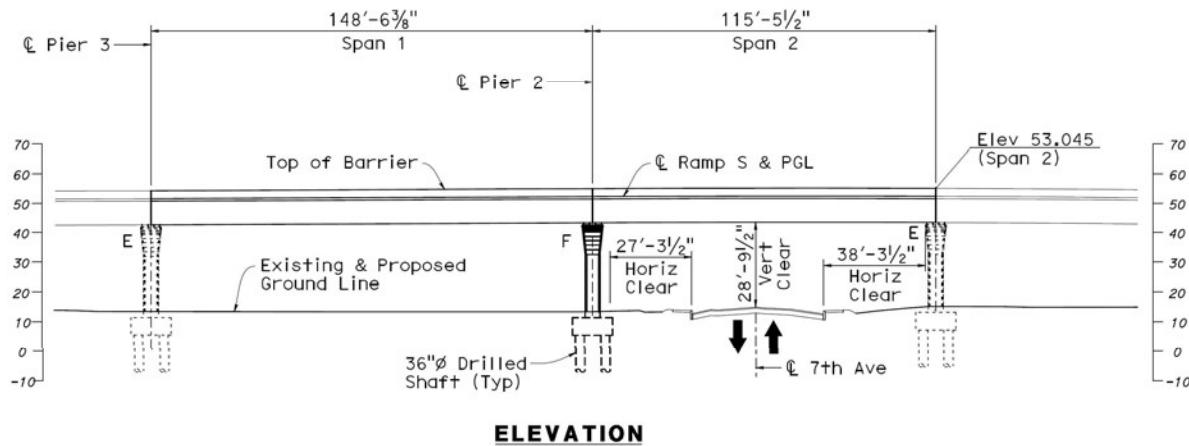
Segmental Span-By-Span Bridge Design Example
